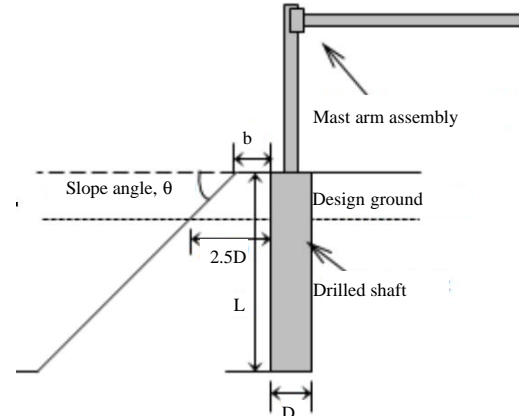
Schematic of a mast arm foundation near an Embankment slope
